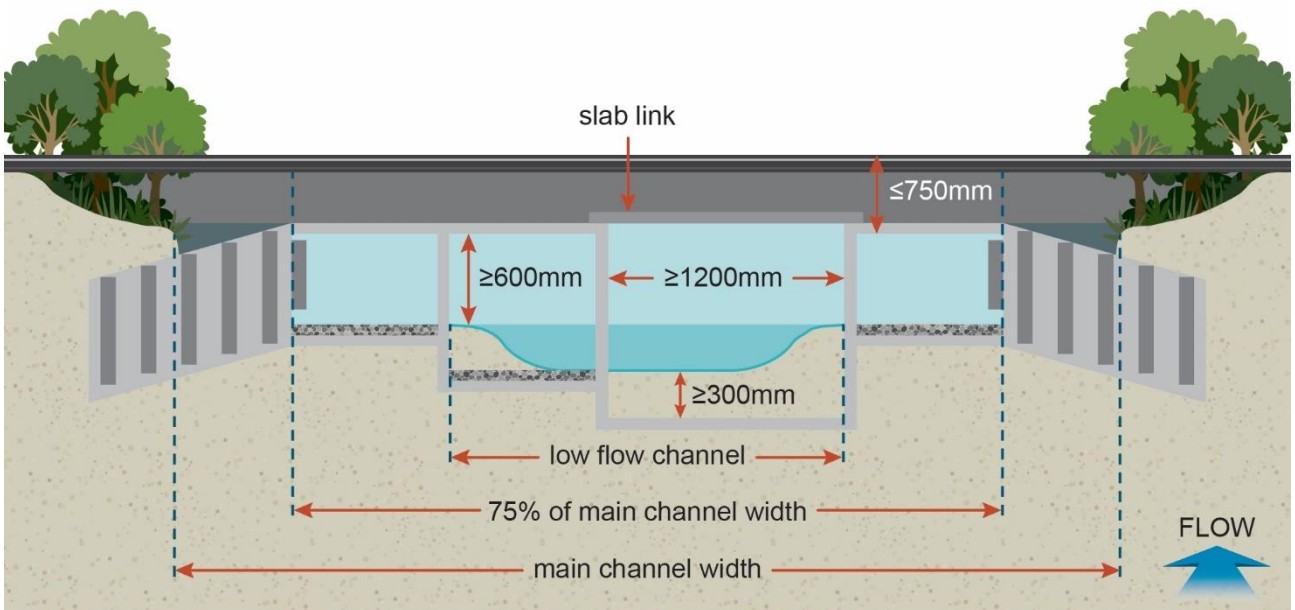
Culvert crossing option 2 (cross-section of waterway) – red waterway
